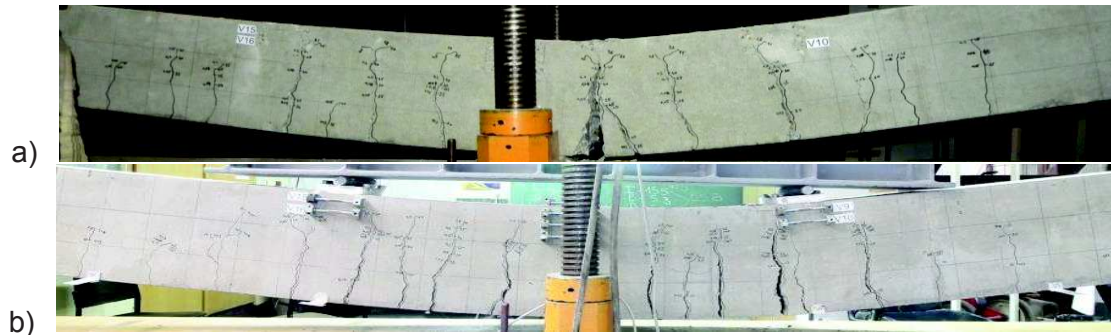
Failure of beams tested under bending a) OPC-1, b) HVFAC-1
